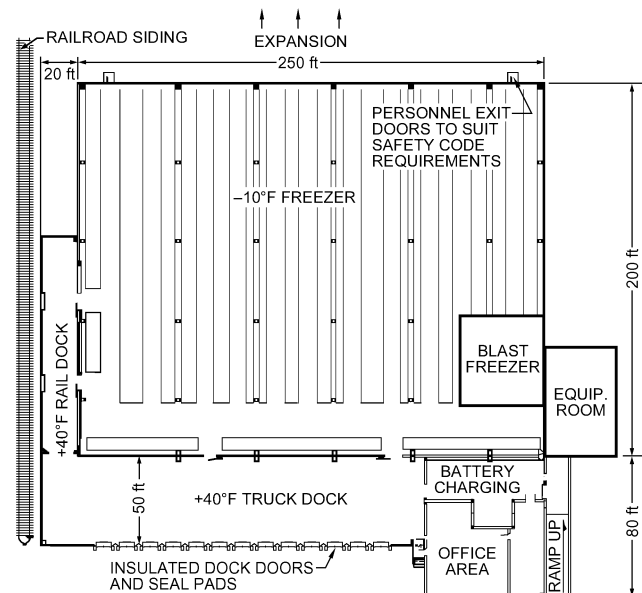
Typical Plan for One-Story Refrigerated Facility
